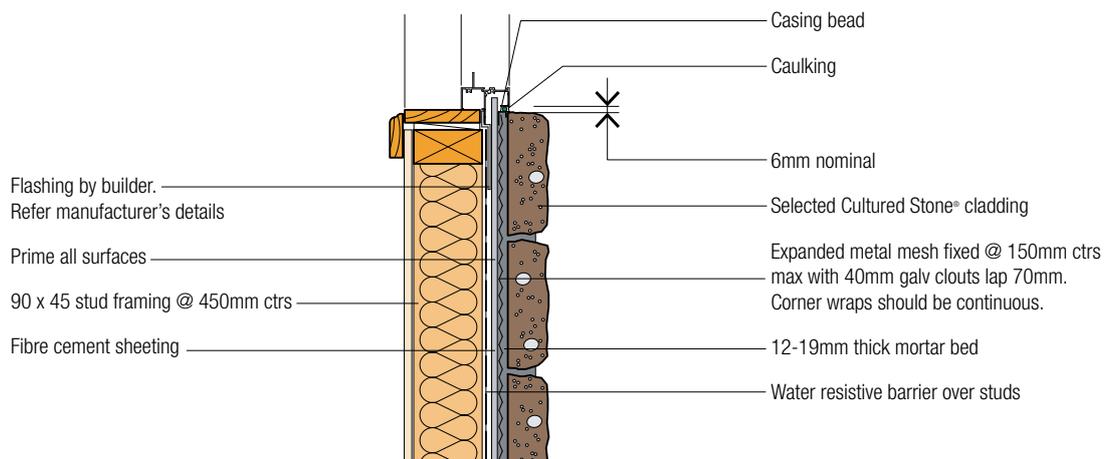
Typical Window Sill - Section (Dwg # CS-06.05)
